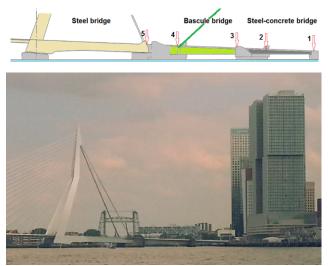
Figure I: Schematic view and photo of the South section of the Erasmus bridge with rail joints numbered and indicated by arrows. "De Rotterdam" building is on the right. Photo: C. de Mooij
